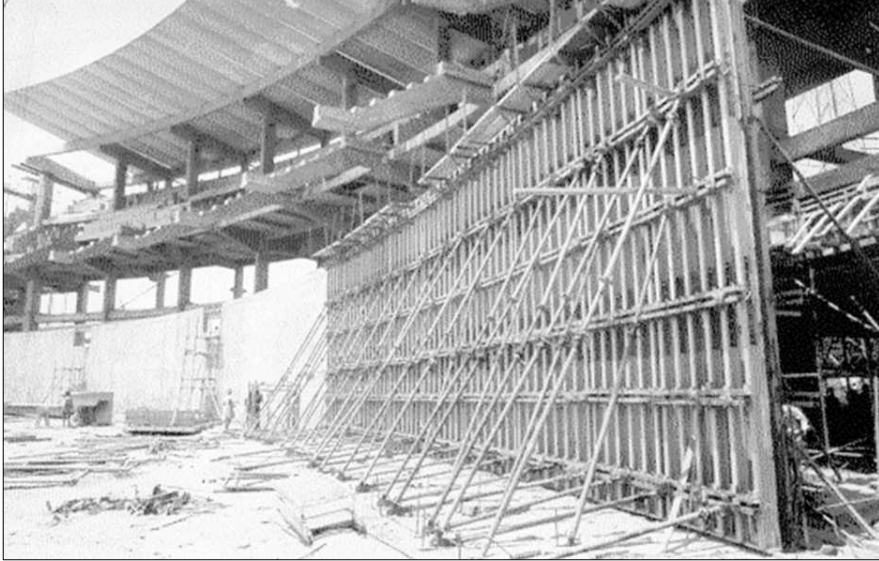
Construction of Retaining Wall Using L&T Wall Formwork.
